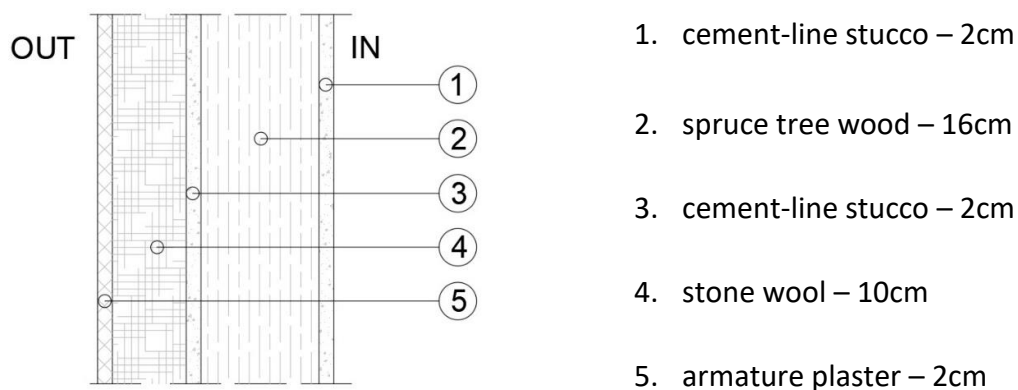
Bondruk wall type 2. (adapted Hadrović 2017)
